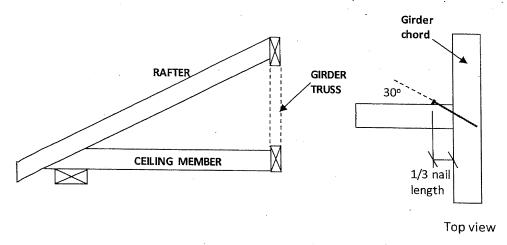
Toe-Nailing Rafter / Ceiling Member to Girder Truss
